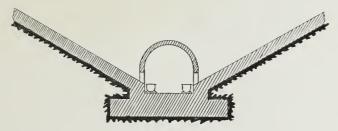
Section through Floor of Bin, with Sloping Bottom.
